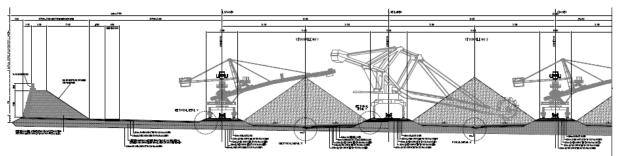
Stockyard cross section showing the proposed berm on the left.
